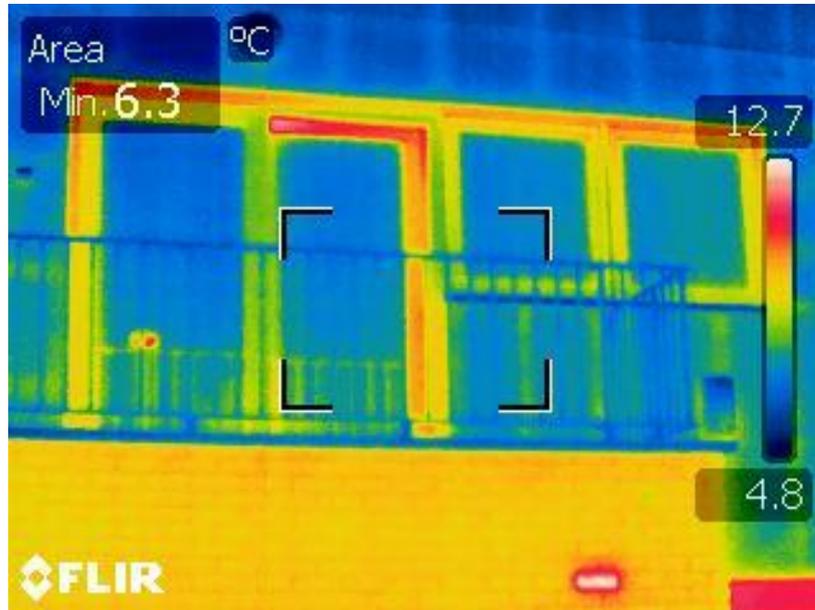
1st Floor Balcony and Windows Phase 1 Heat Loss
